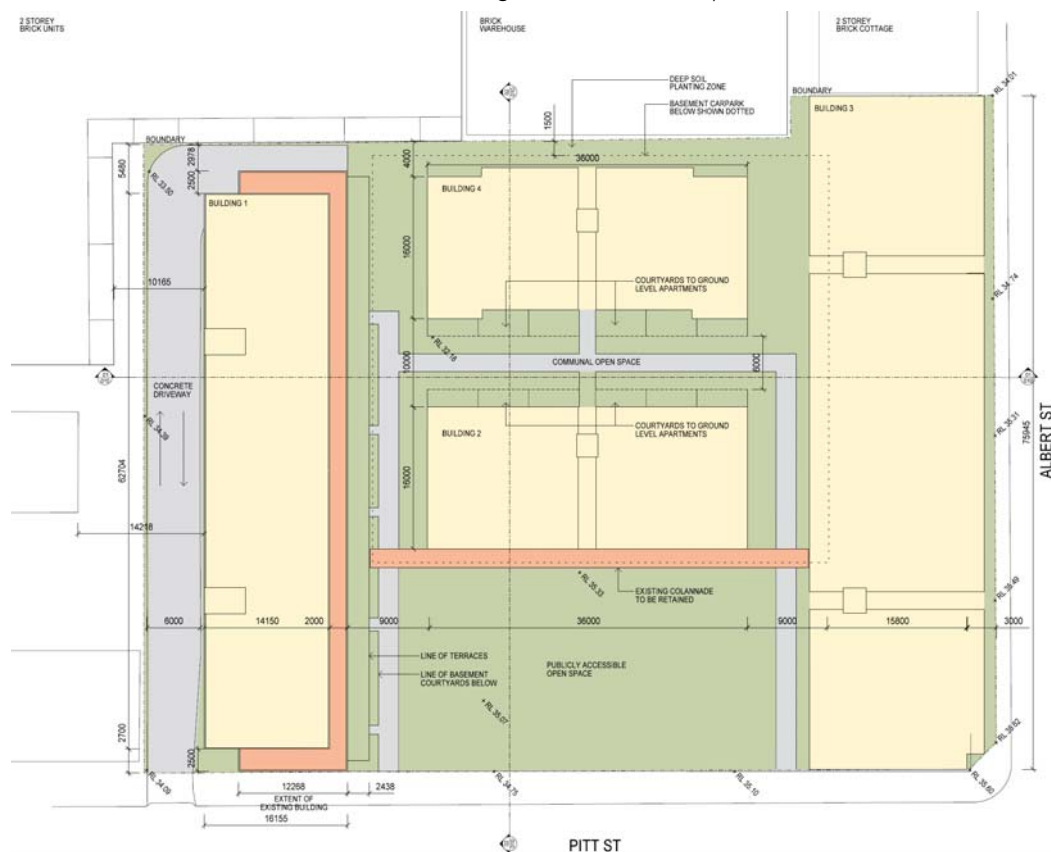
Site plan of proposed concept, illustrating proposed location, orientation and setback of proposed building forms.
